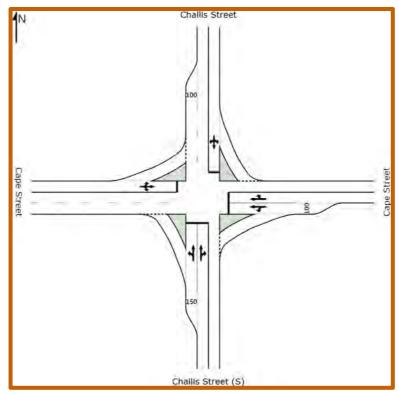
Recommended Layout for the Intersection of Challis Street and Cape Street
